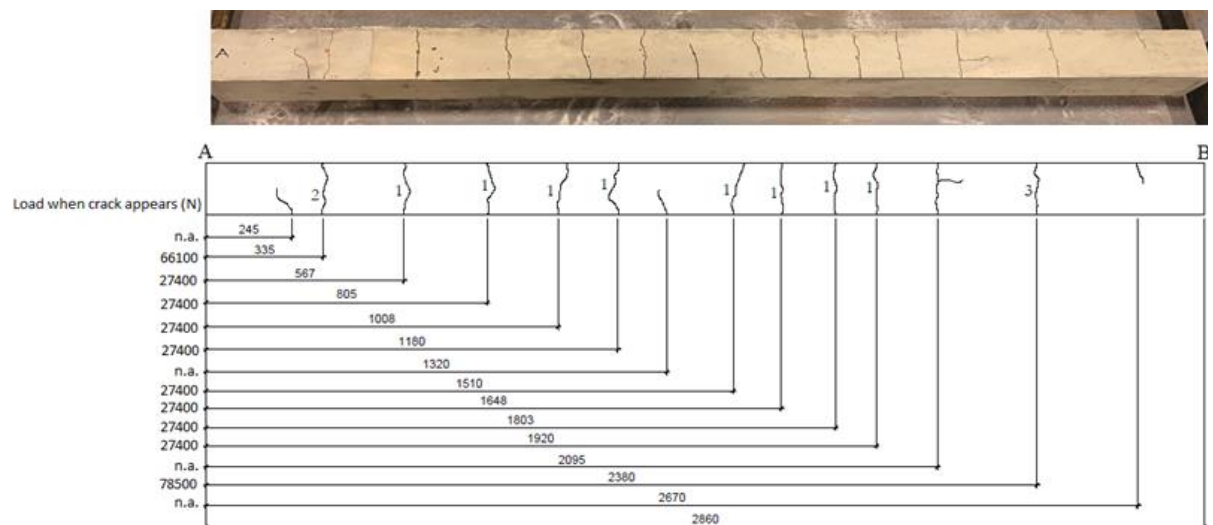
Prism test and crack pattern: #6 steel – specimen 1.
